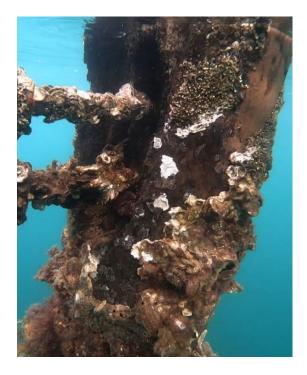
Typical Condition 5 Timber Pile (Defect: Necking & Damage at cross brace)
